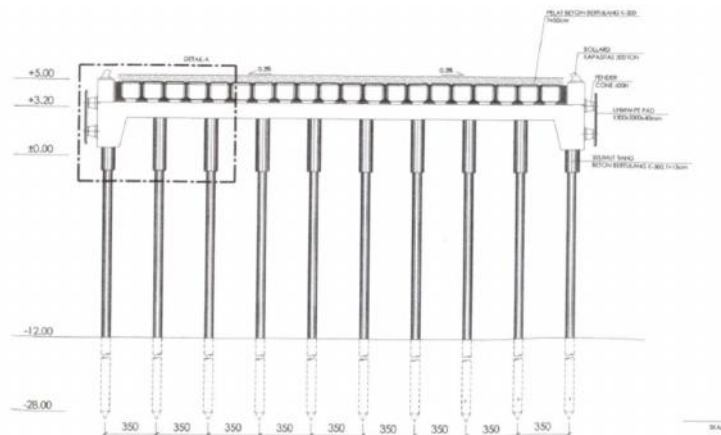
Front View of Pile Foundation Trestle source by B.P. Batam
